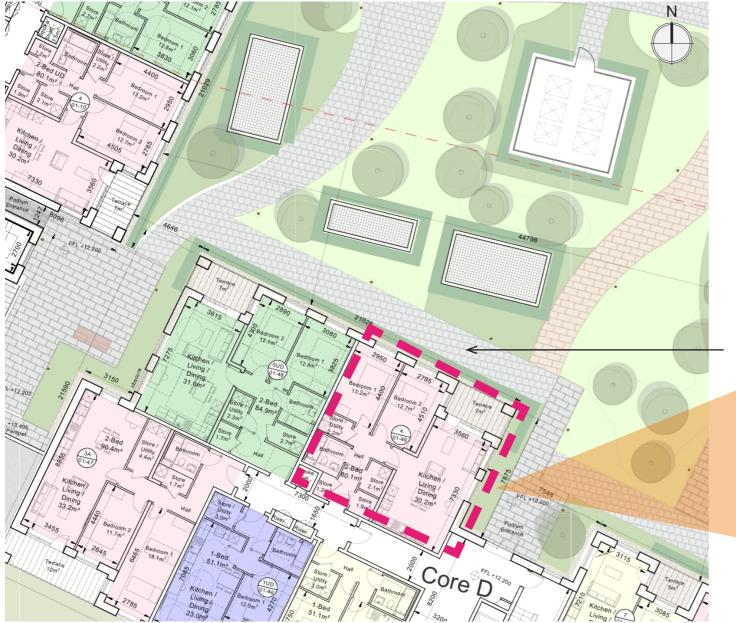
Block 6 First Floor Key Plan with Unit 06-01-49 highlighted
